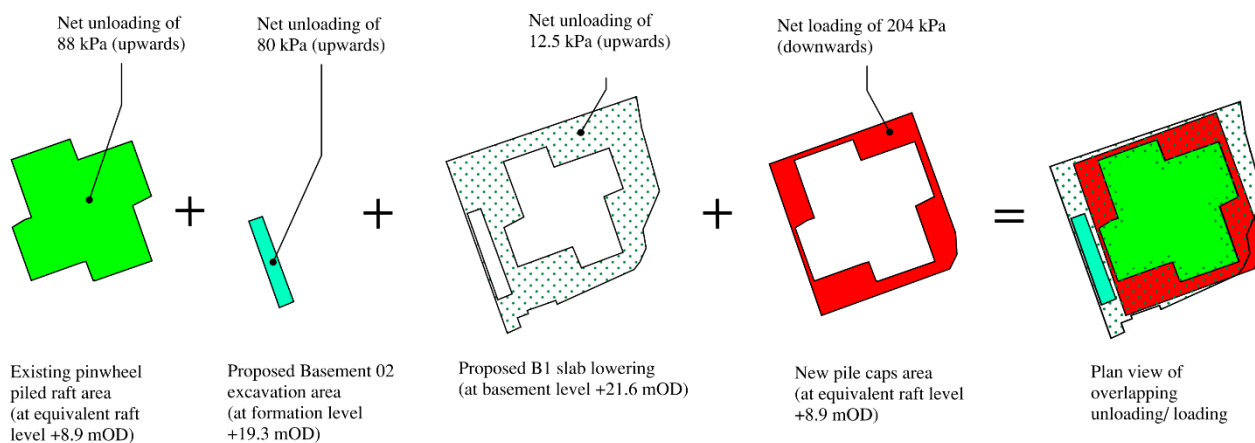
Net unloading/ loading applied in Oasys PDISP model, resulting from partial superstructure deconstruction, proposed B2 excavation, B1 slab lowering and new superstructure loading.
